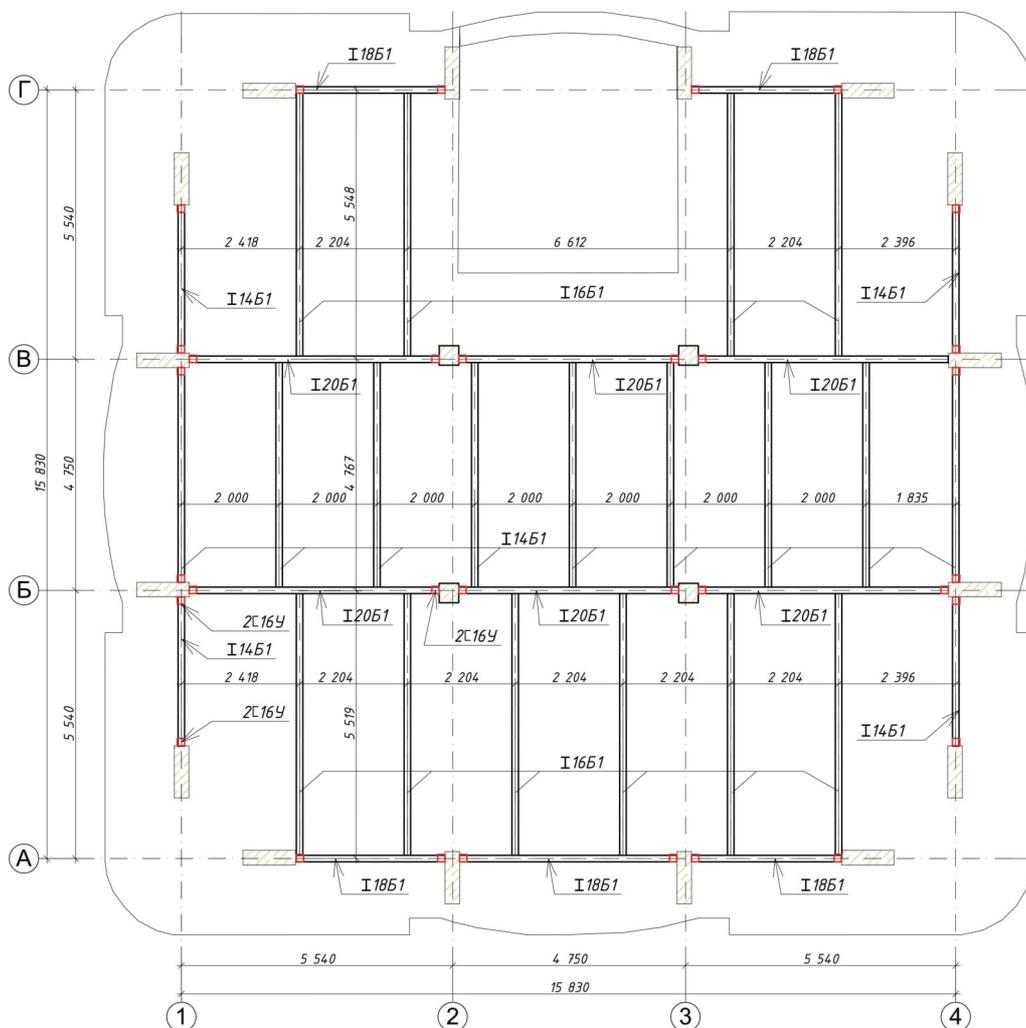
Scheme of reinforcing elements of the floor slab according to the method of supplying steel beams with the installation of additional columns
